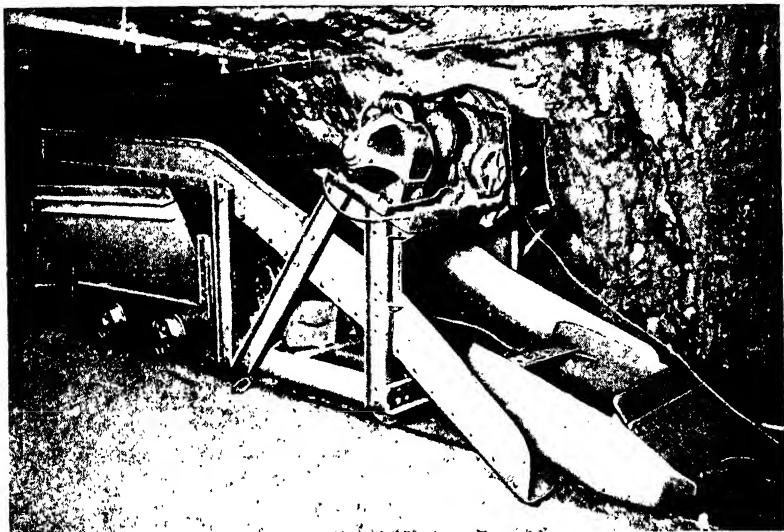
Slusher or scraper type of muck loader. (Courtesy of Sullivan Machinery Co.)
